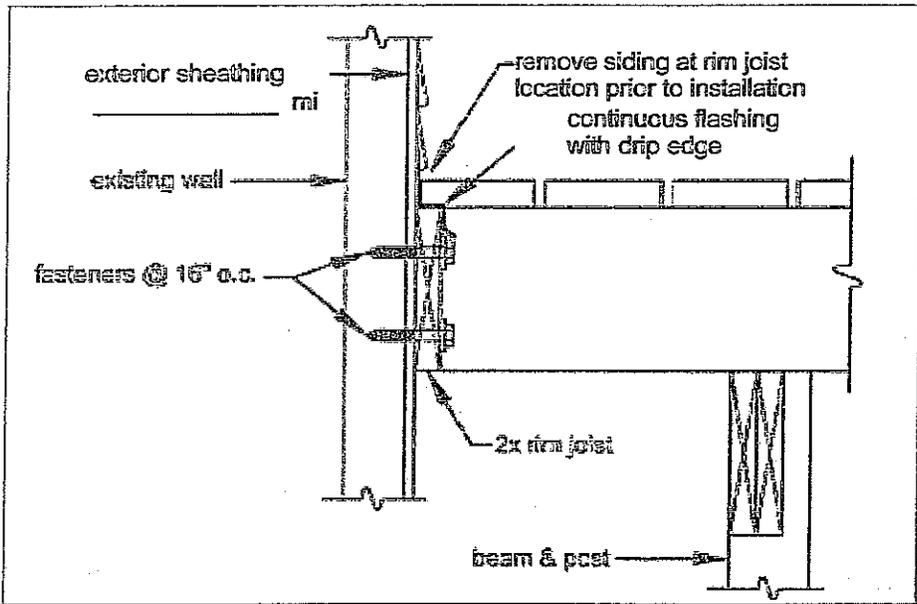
ATTACHMENT TO HOUSE LATERAL SUPPORT
